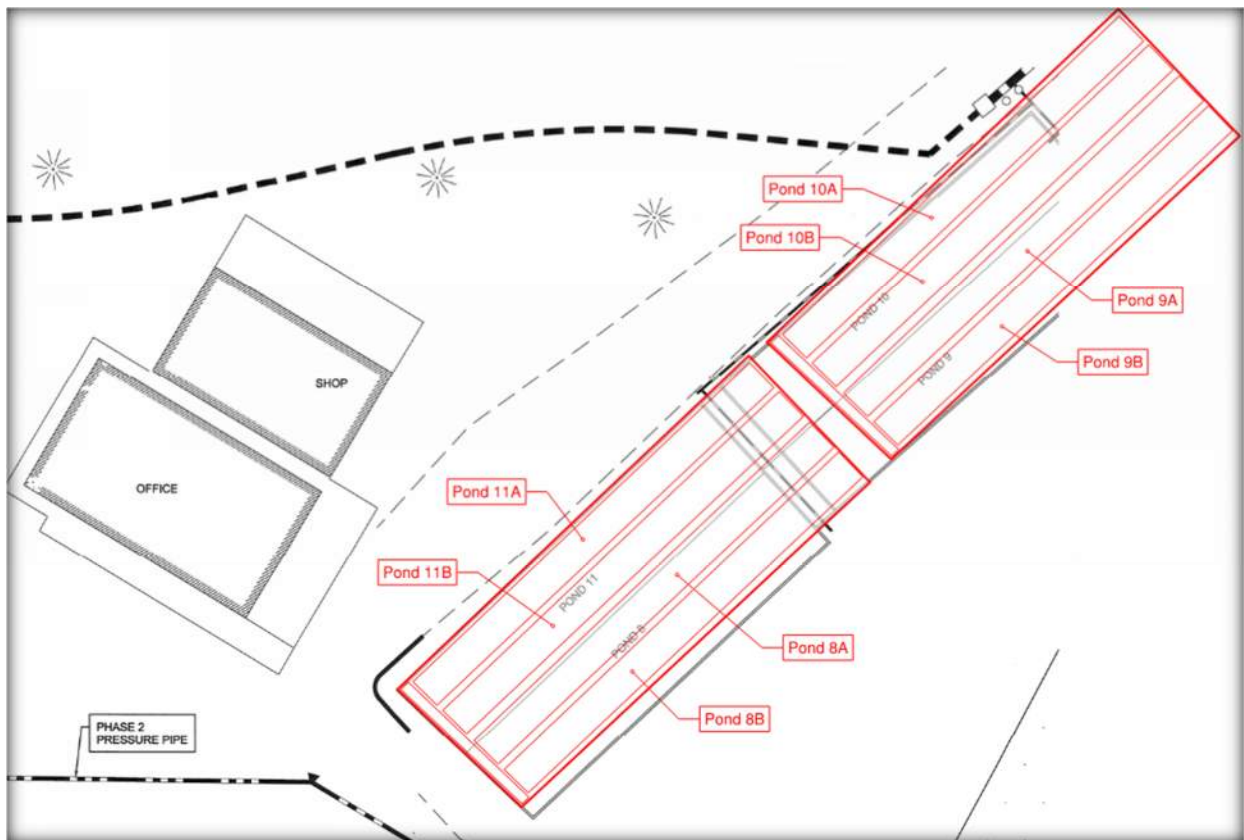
Cedar Creek – Proposed Raceway Layout (Ponds 8-11)
